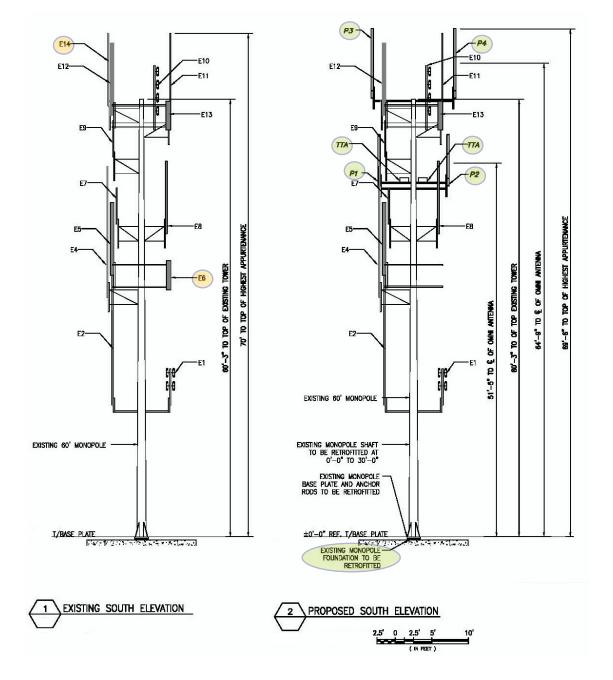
Site 4 - Mt. Tamalpais Existing and Proposed Elevations
